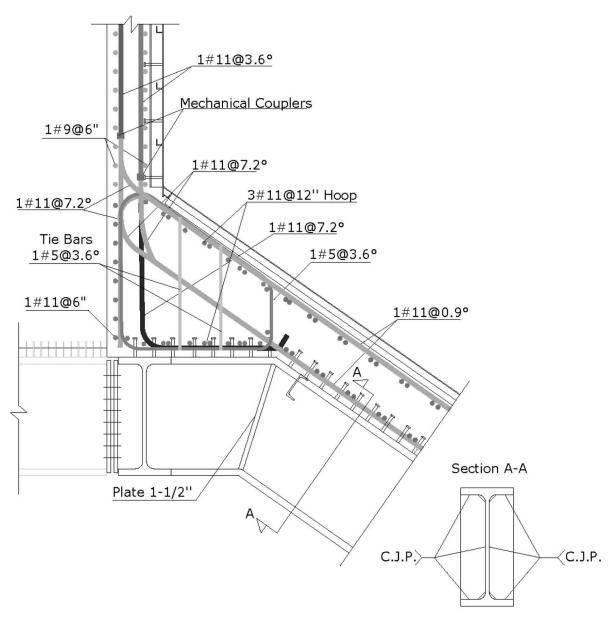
H.5-11 (Sheet 1 of 6) [Design of Shield Building: Roof and Air Inlets]
